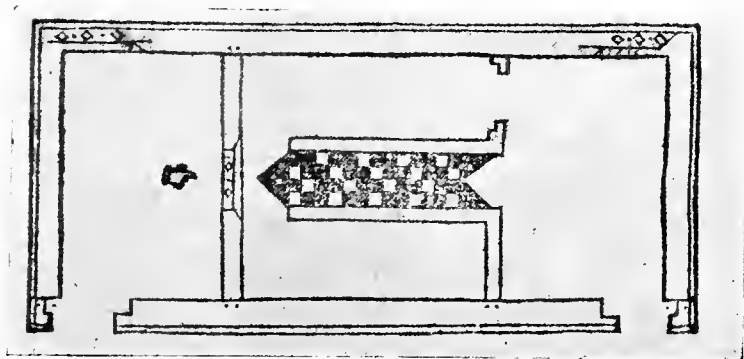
Ground plan of oast-house in Kent, 1574.
